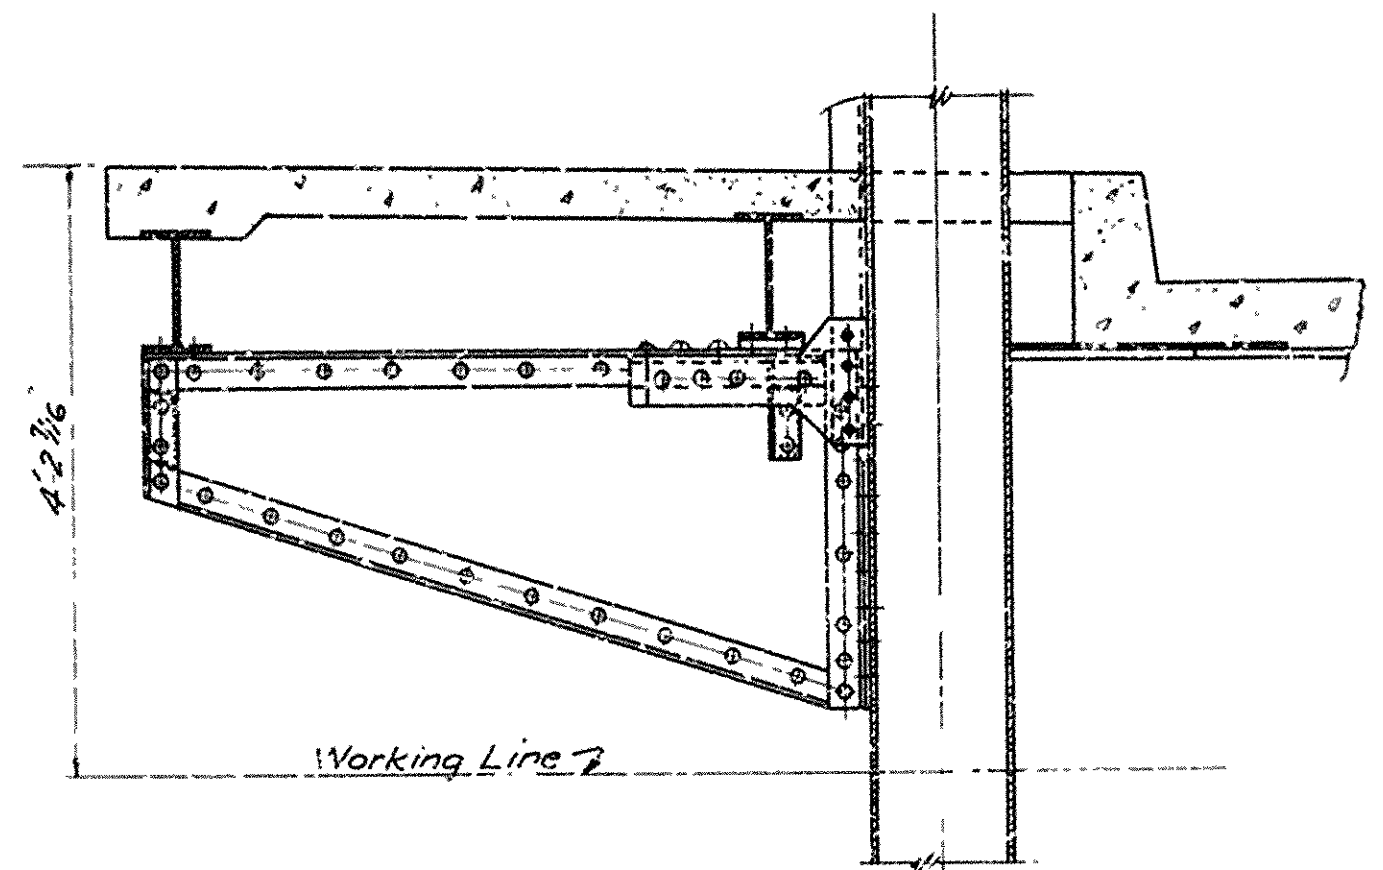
DETAIL OF JOINT AROUND MEMBERS THRU SWK. SLAB
